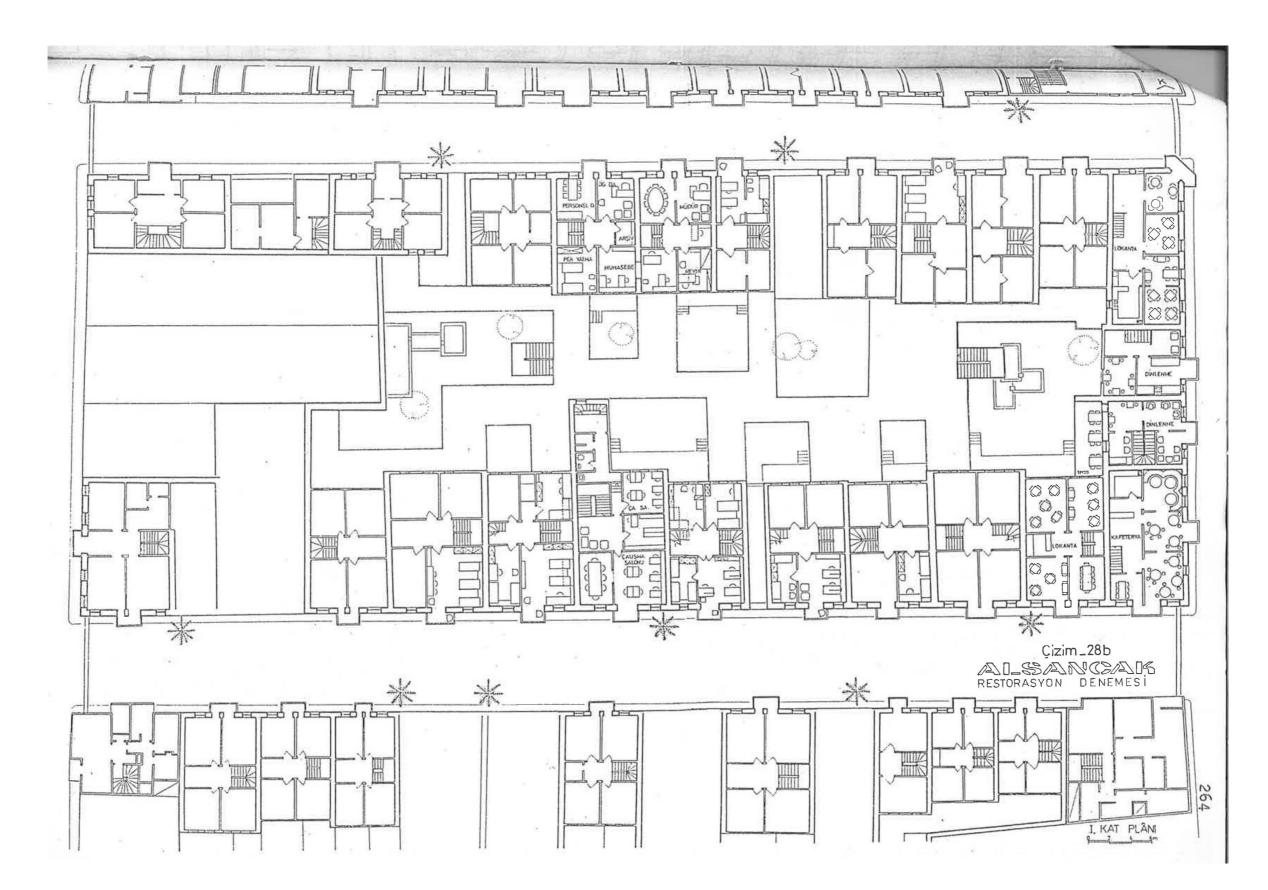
First Floor Plans of İzmir Houses on 1453 streets (Source:Akyüz 1985)
